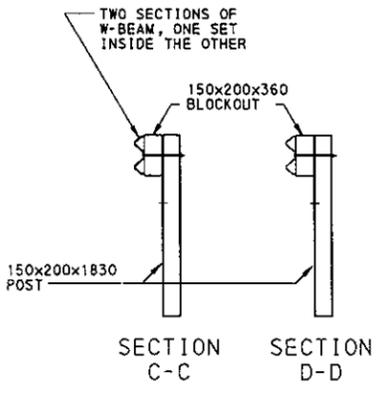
DETAILS OF NESTED W-BEAM GUIDERAIL ACROSS LOW-FILL CULVERTS. CASE 2
